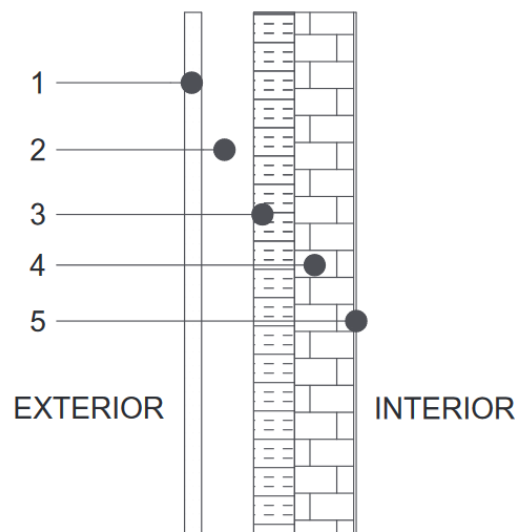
Schematic section of a ventilated façade, where: 1- new cladding, 2- ventilated cavity, 3- added insulation, 4- original brick wall, 5- internal layer. Source: Diarce, G. et al. (2013). *Ventilated active façade with PCM*. *Applied Energy*, 109, 530-537.
